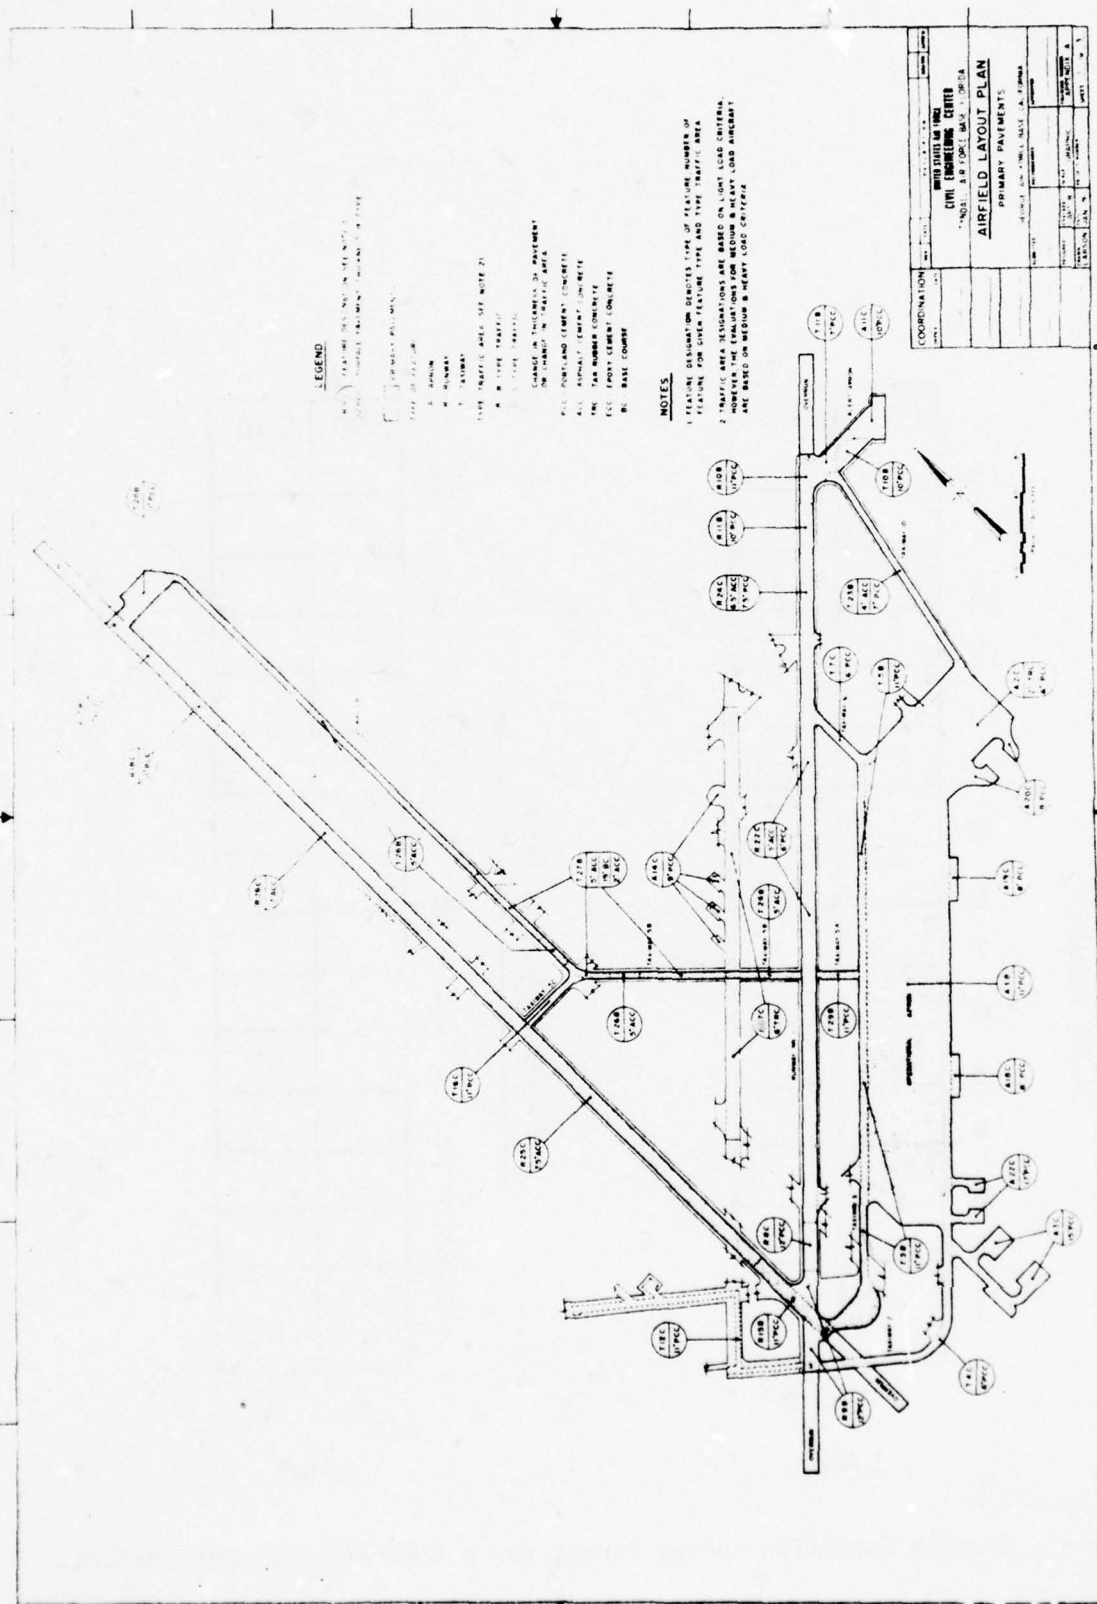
Pavement Features Identified on Airfield Layout Plan.
